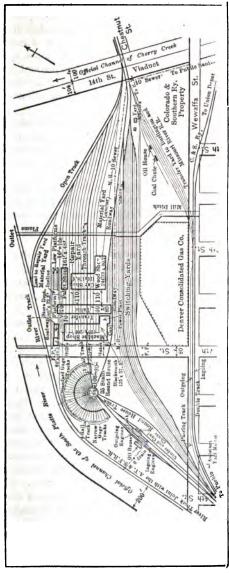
Plan of the New Shops and Yards of the Colorado & Southern Railway at Denver.
